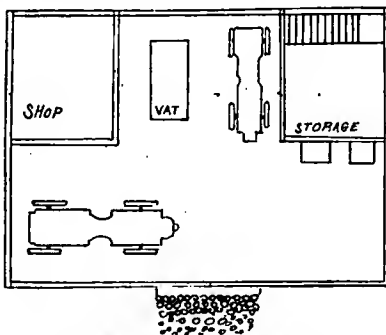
Floor plan arrangement for the autos and their appurtenances.
